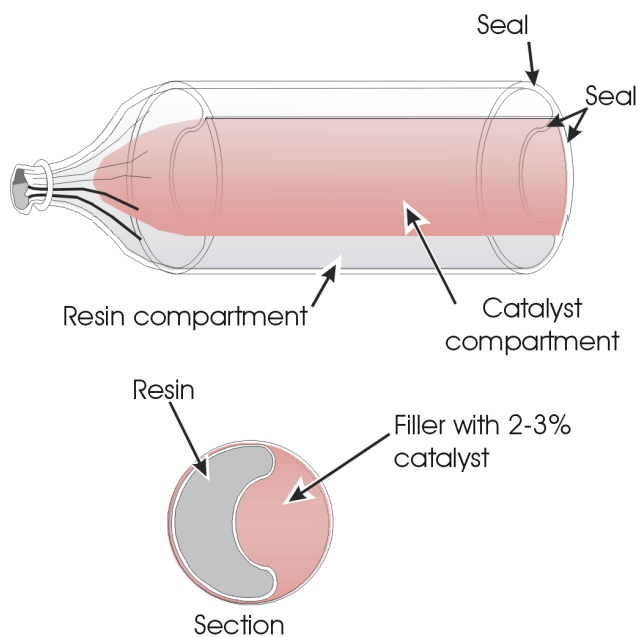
Resin cartridge used to develop anchorage for roof bolts.
